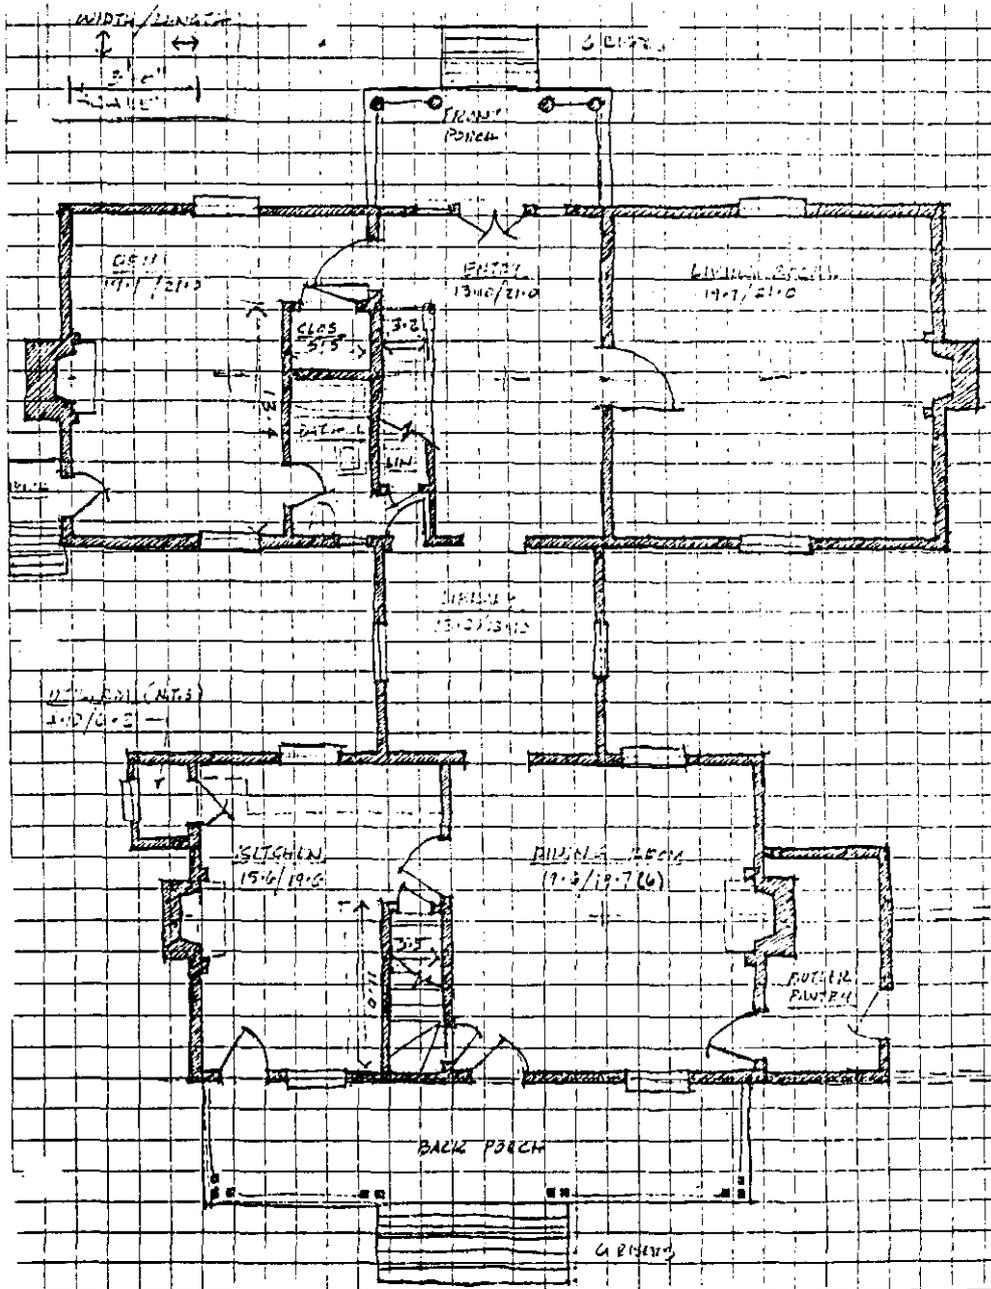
Exhibit A. First-floor plan of Long Grass (based on sketch plan by Peter Jacobsen, ca. 1990). Each square represents one foot. North is to the top of the plan.
